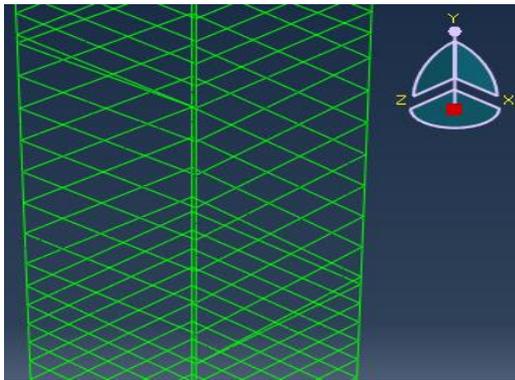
Undeformed shape of the reinforcement embedded in specimen S30Am23
